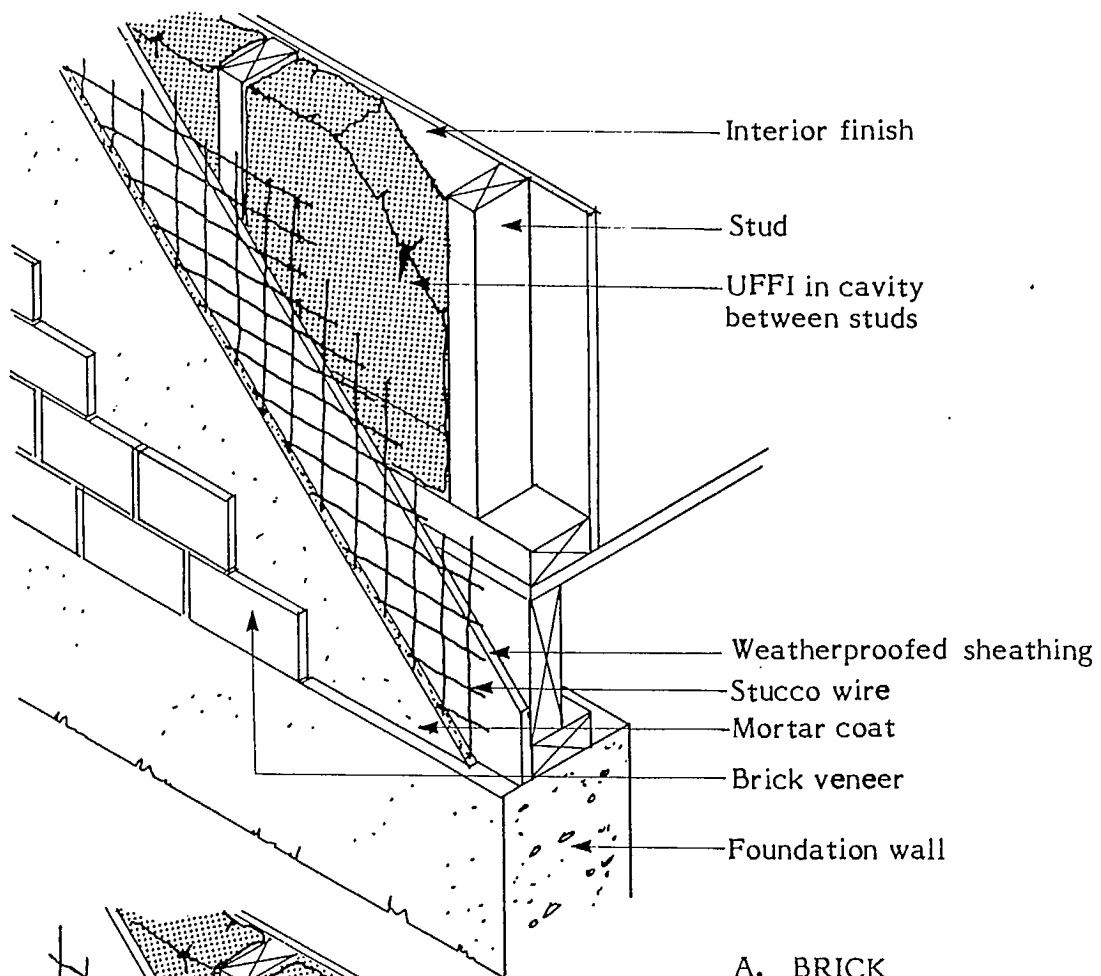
POSSIBLE UFFI LOCATIONS IN A BRICK VENEER
